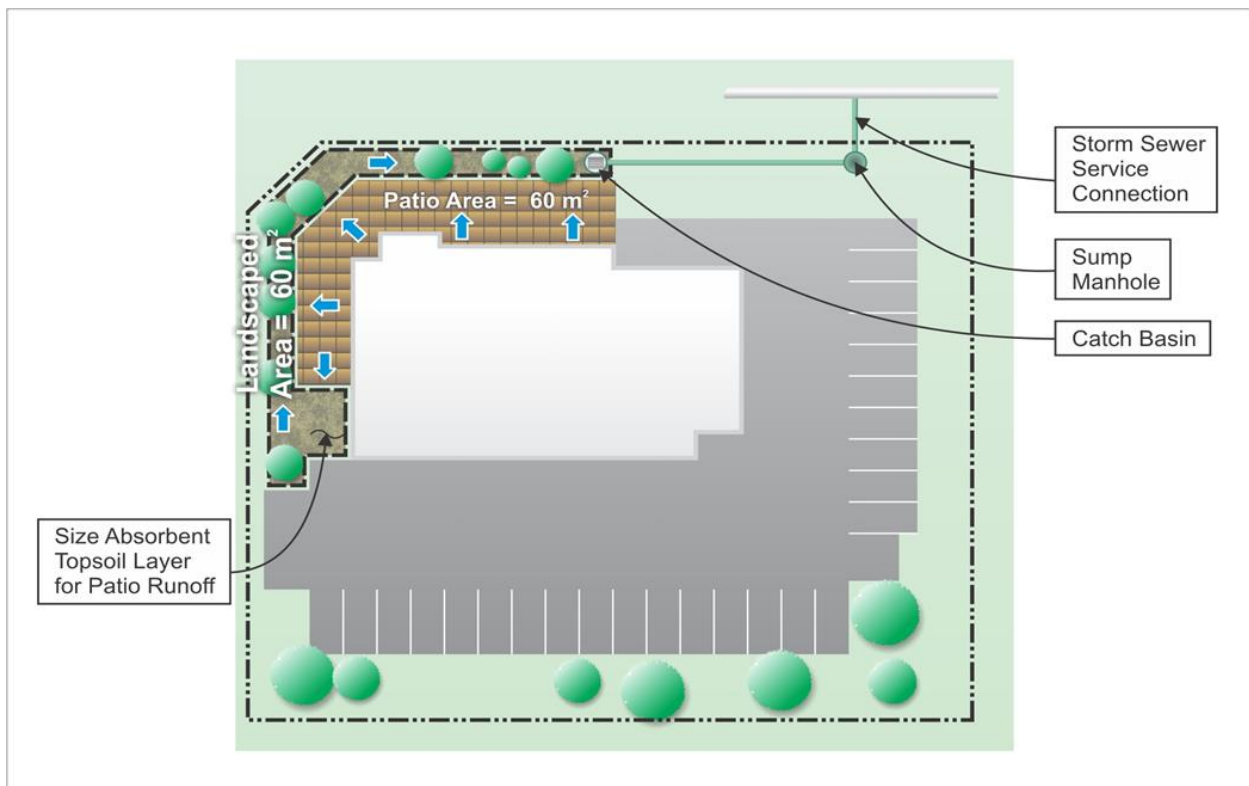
Example - Plan view of site with patio and landscape areas highlighted
